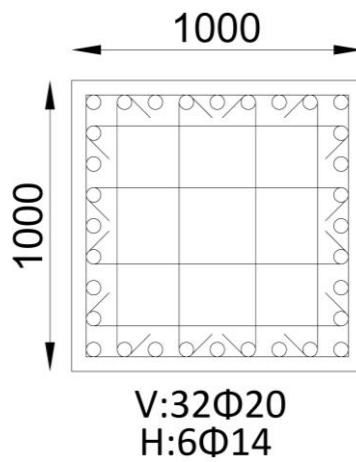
Column Longitudinal Reinforcement for Stories Between 1 - 10
